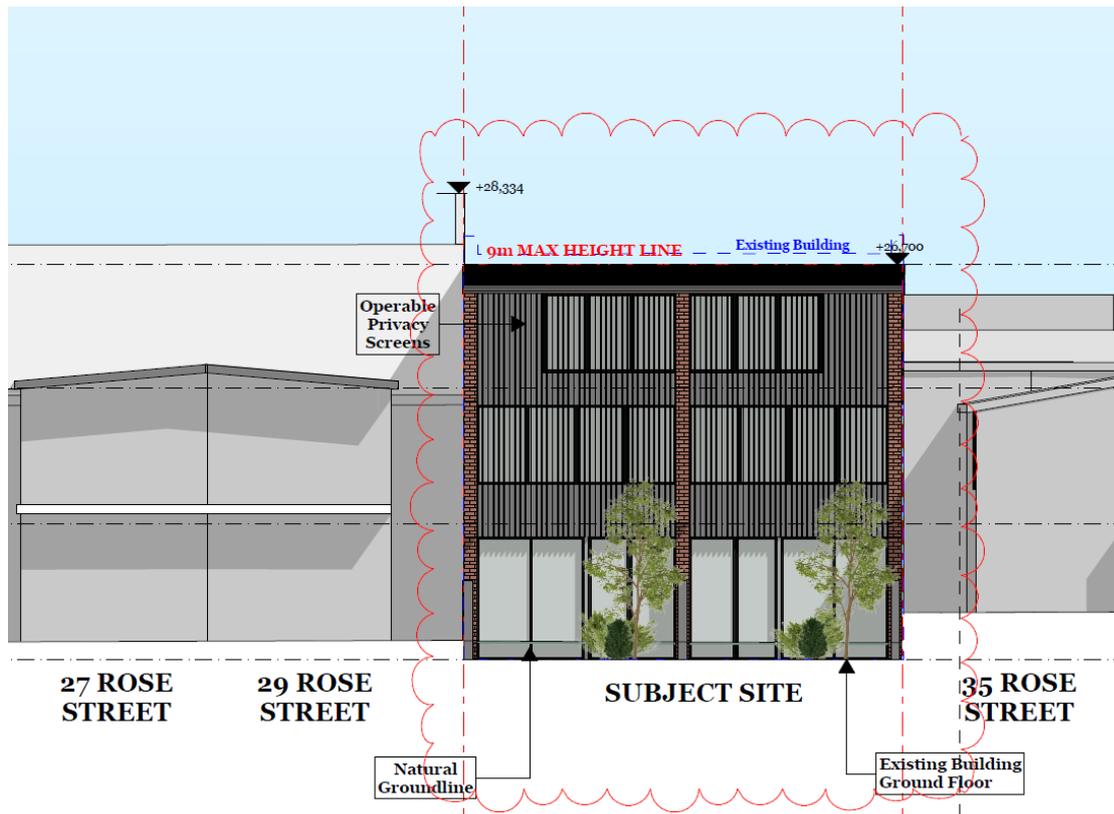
The rear (west) elevation of the proposed terrace dwellings
